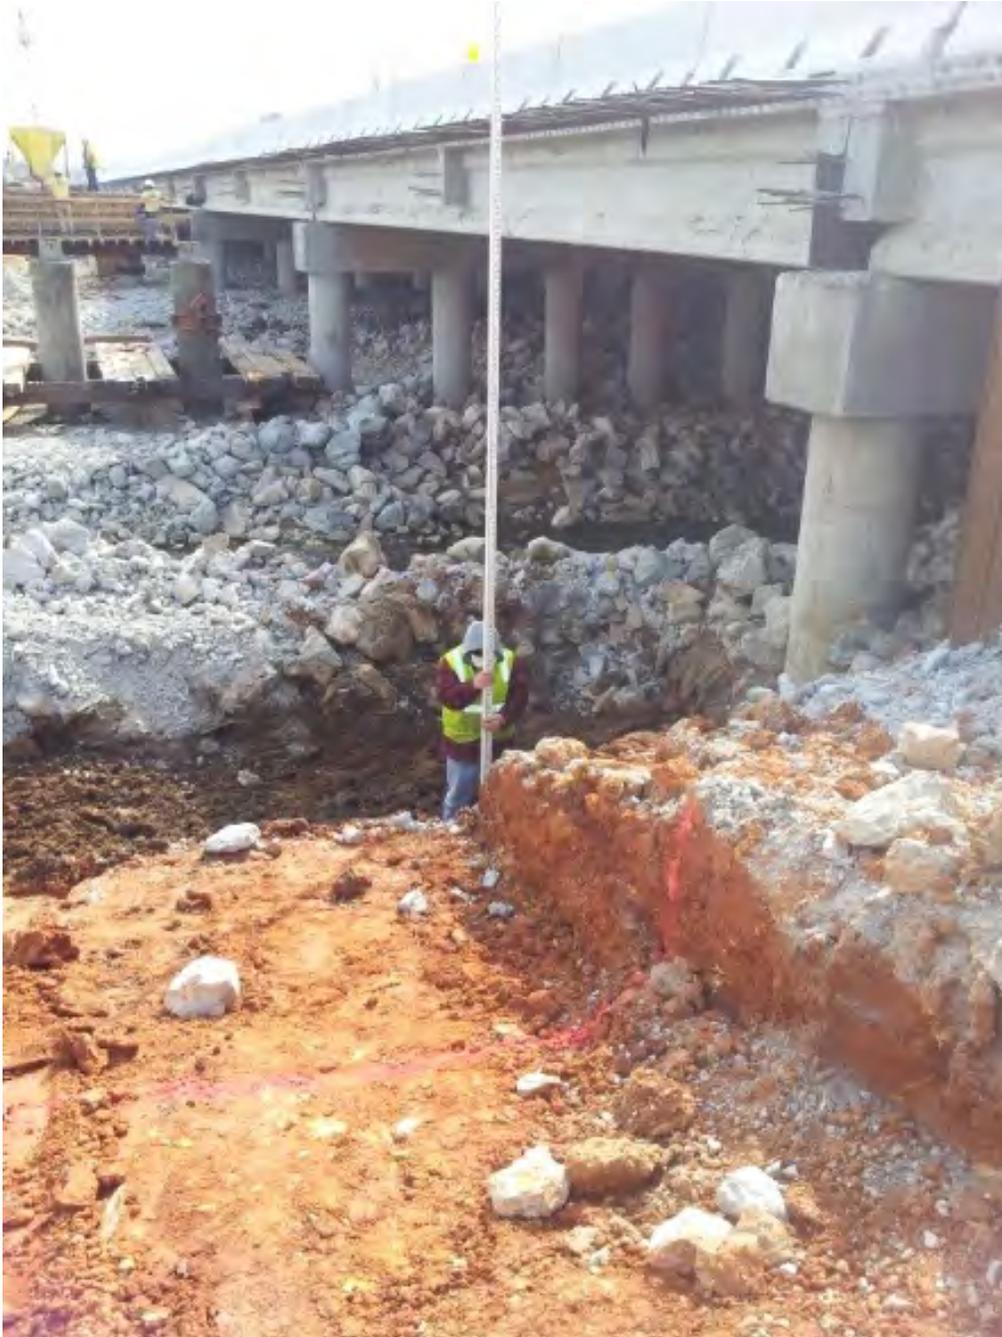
Western Abutment and bent 2 excavation. Photo looks east.
